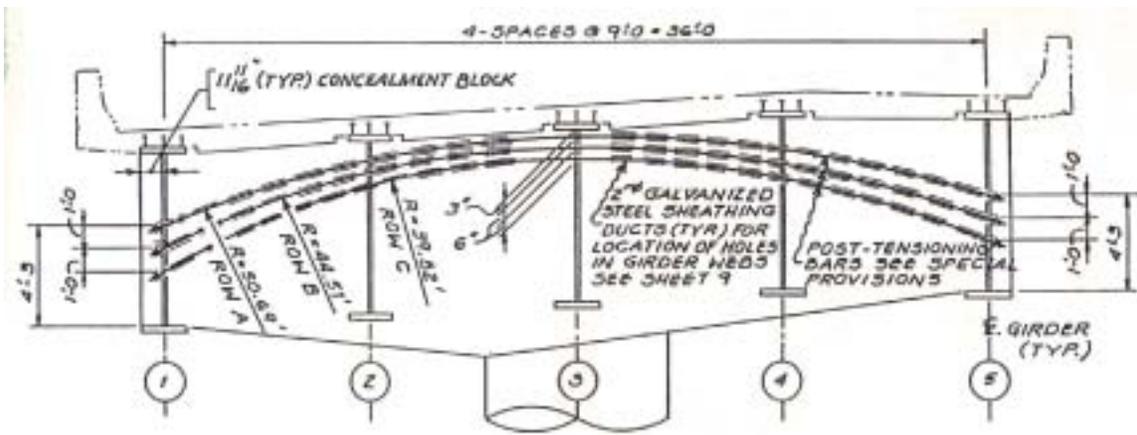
Typical Post-tensioned Concrete Integral Pier Cap
